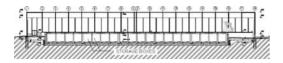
Typical longitudinal section of the 1st double-line of storage boxes in RRWD in Mochovce.
